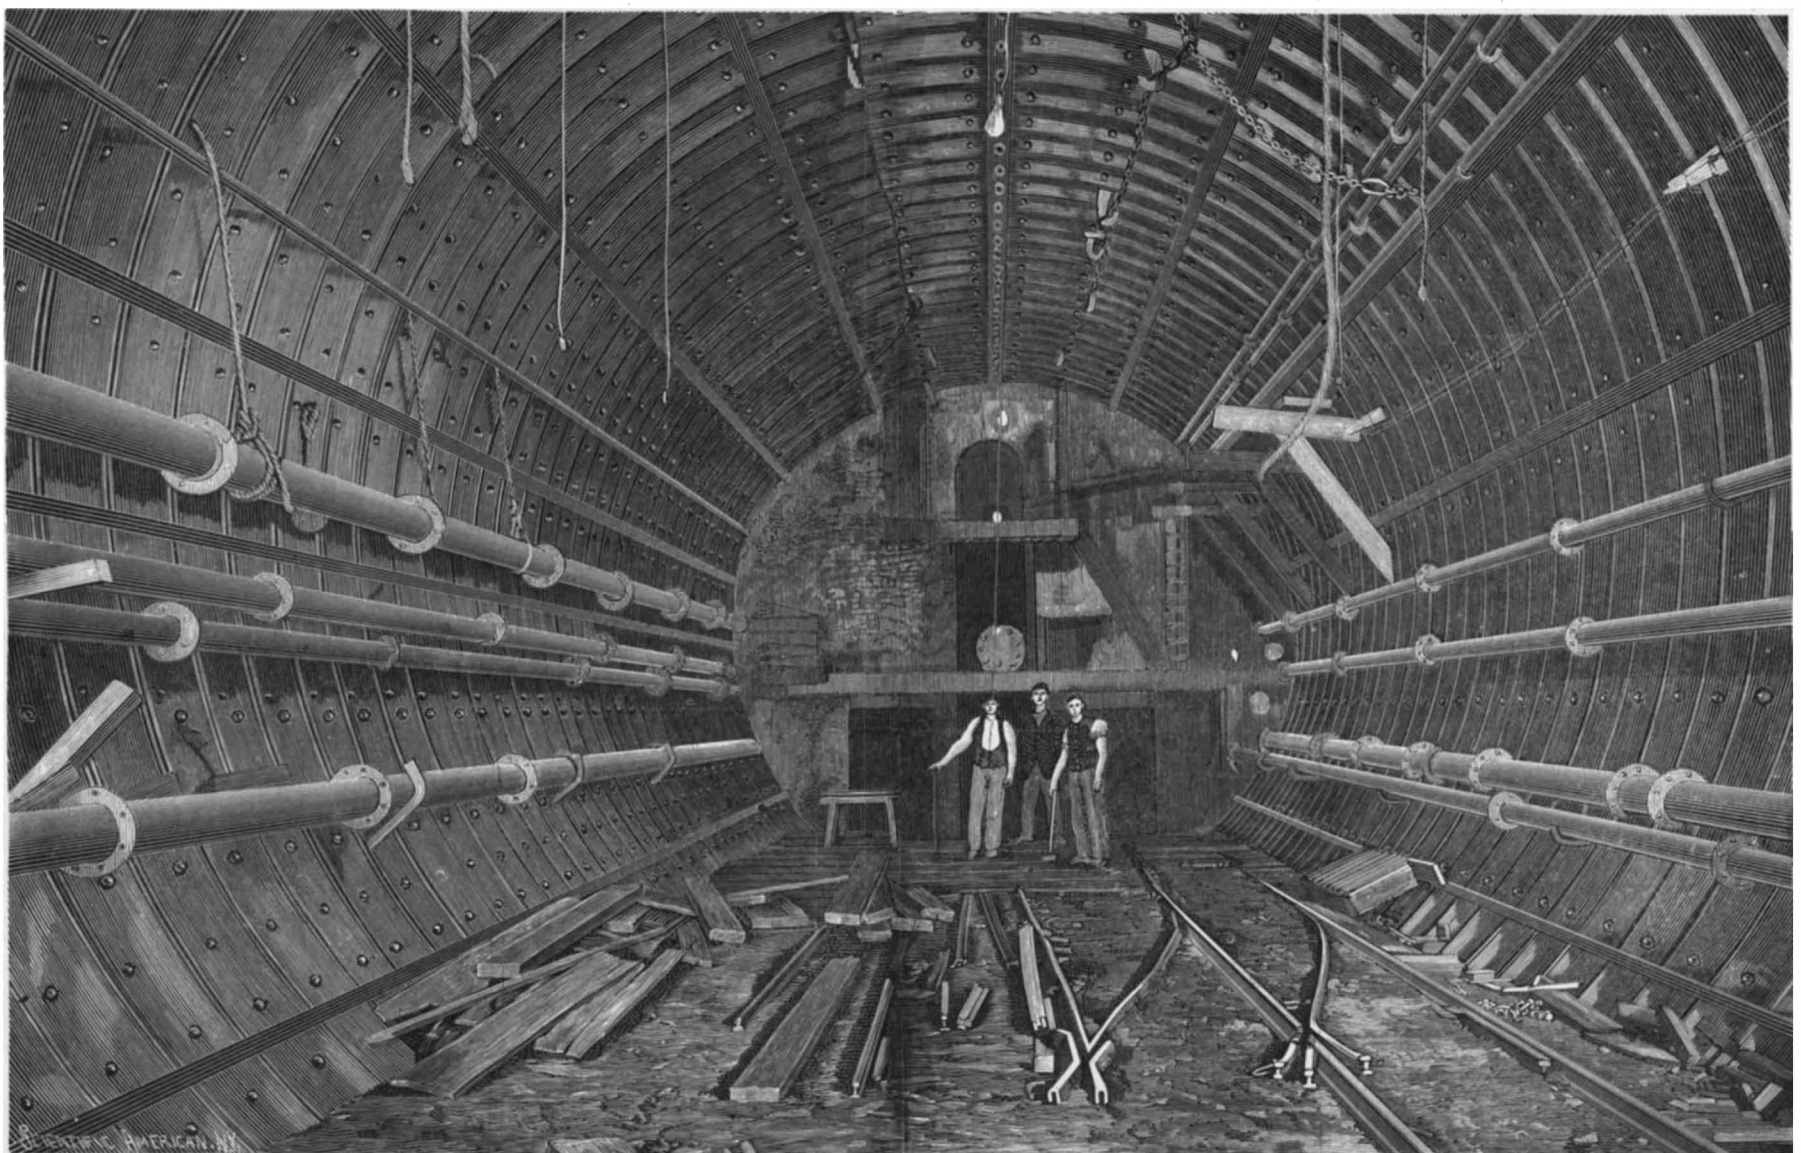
INTERIOR VIEW OF BLACKWALL TUNNEL, BENEATH THE THAMES, SHOWING CAST IRON LINING COMPLETED.
